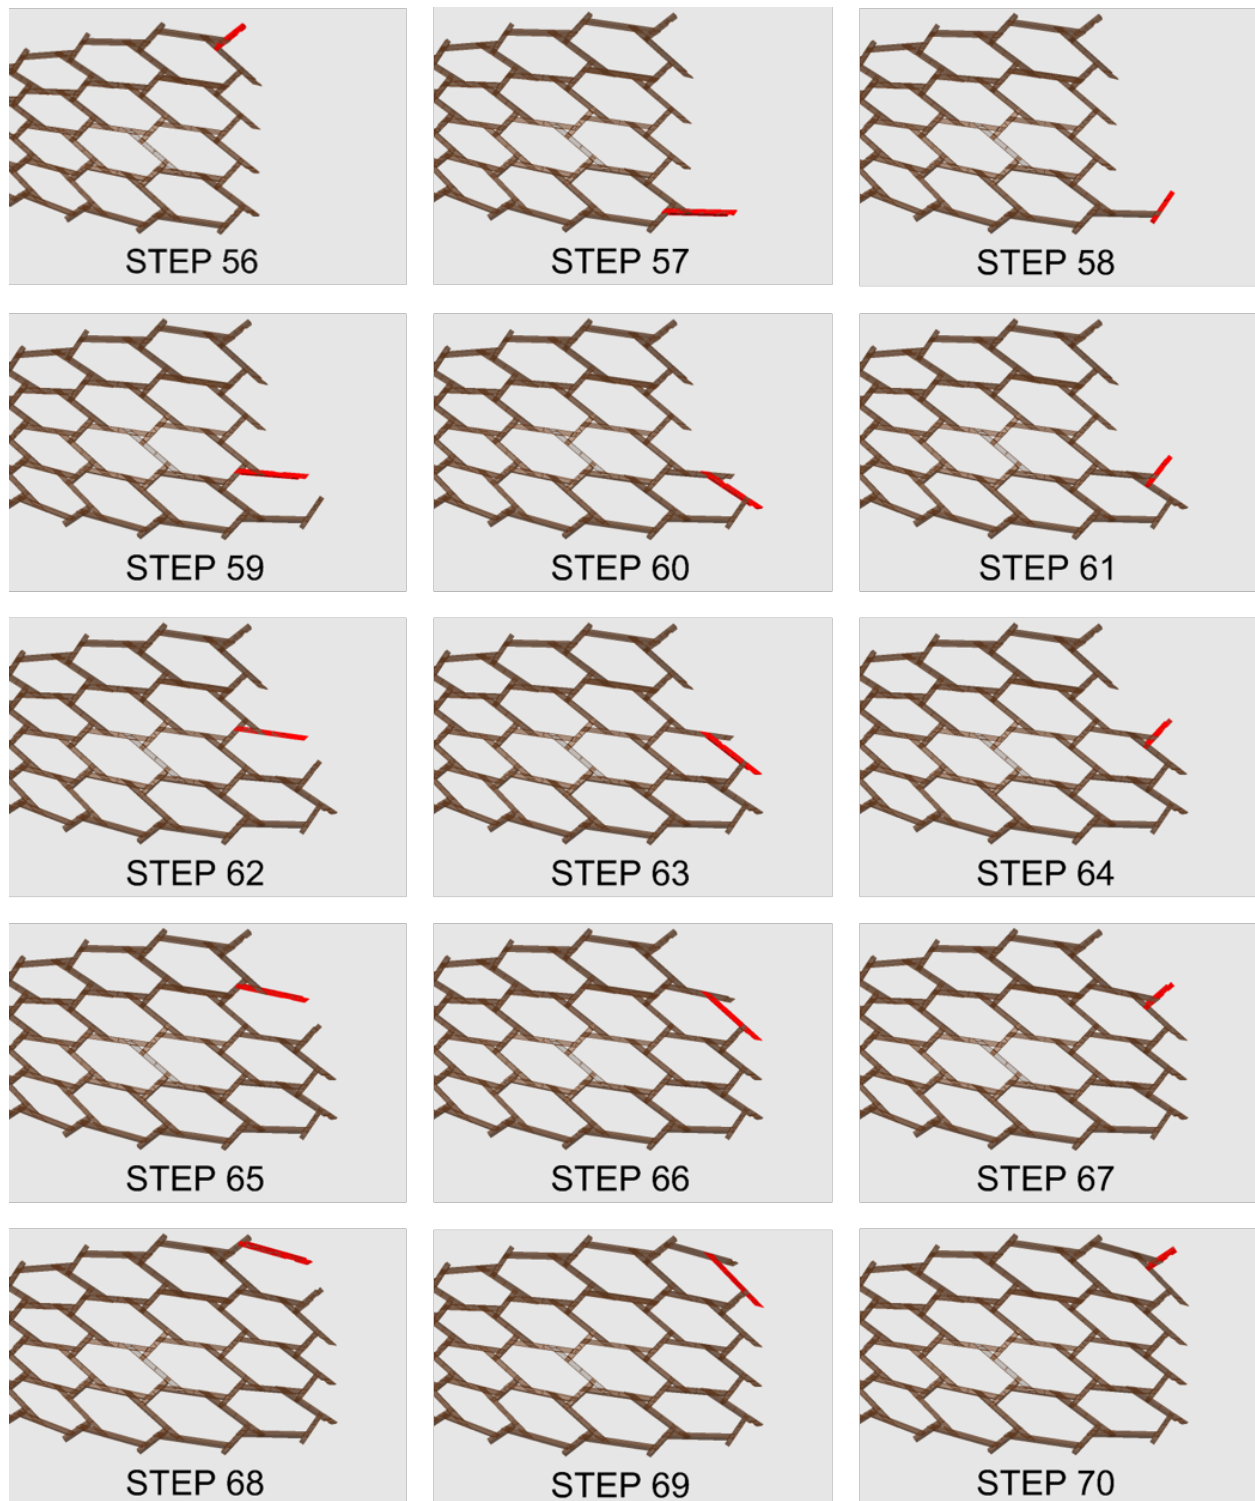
Assembly step 56 until 70. Already placed beams are marked brown, new beams are marked red
